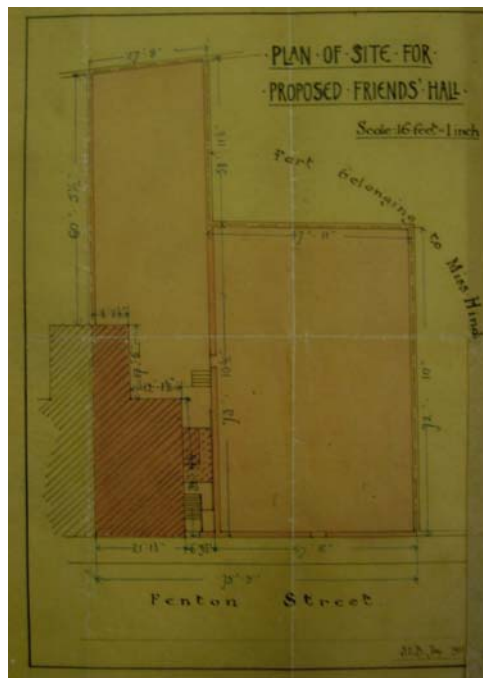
(left) Plan of proposed Friends' Hall showing No. 4 (LRO FRL 2/1/29/4 1901-1903)
